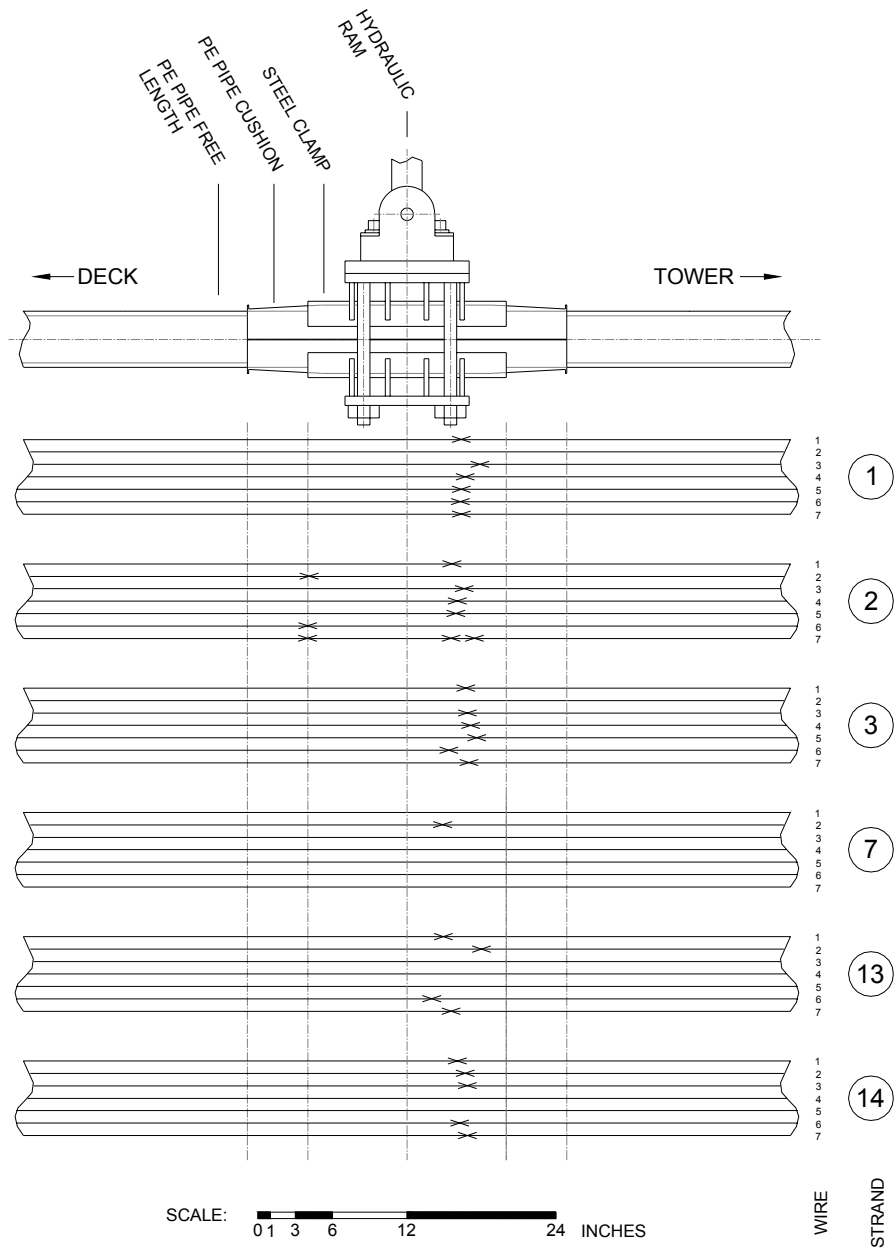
Location of wire breaks under the load point - Specimen 7
